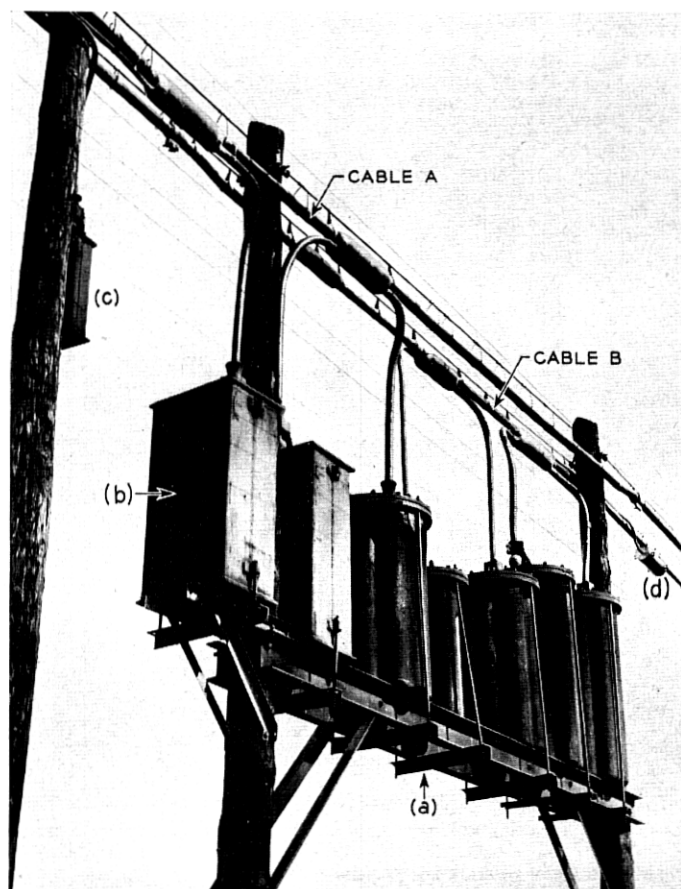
Installed aerial toll cable loading. Four different methods of supporting the loading-coil cases are used in this installation, which provides loading for two cables: (a) On the platform of a 2-pole "H" fixture. (1 large welded steel case, and 5 large cast iron cases.) (b) A pole balcony supporting a large welded steel case. In this installation, it provides an extension of the "H" fixture. (c) A small welded steel case equipped with brackets, and fastened directly to pole. (d) Clamping a small lead-sleeve case to the main cable and its supporting strand. (This case contains program circuit loading coils.)
